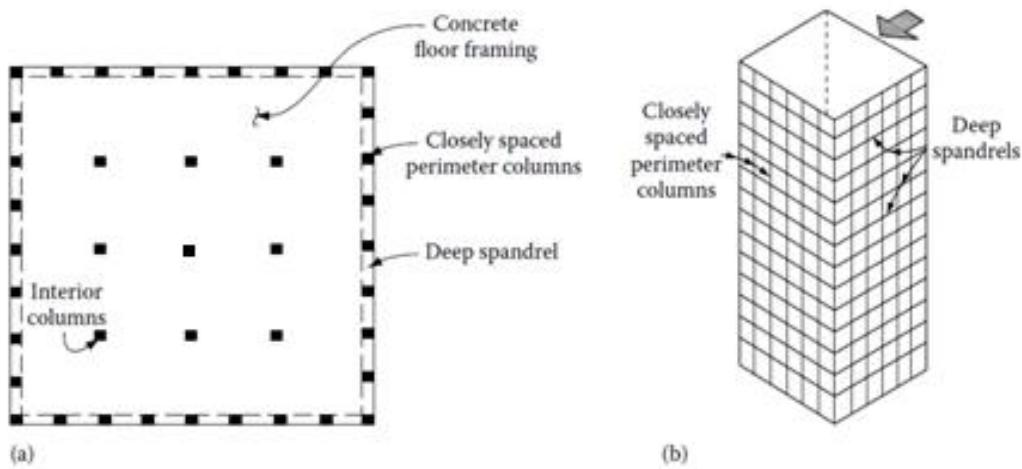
Frame Tube building (a) Schematic plan and (b) isometric view
